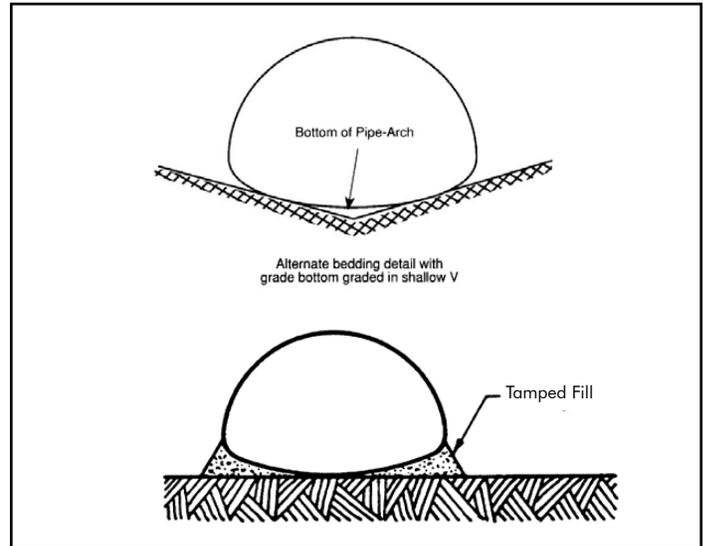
Methods for attaining proper compaction under haunches of structural plate pipe-arches and underpasses.
